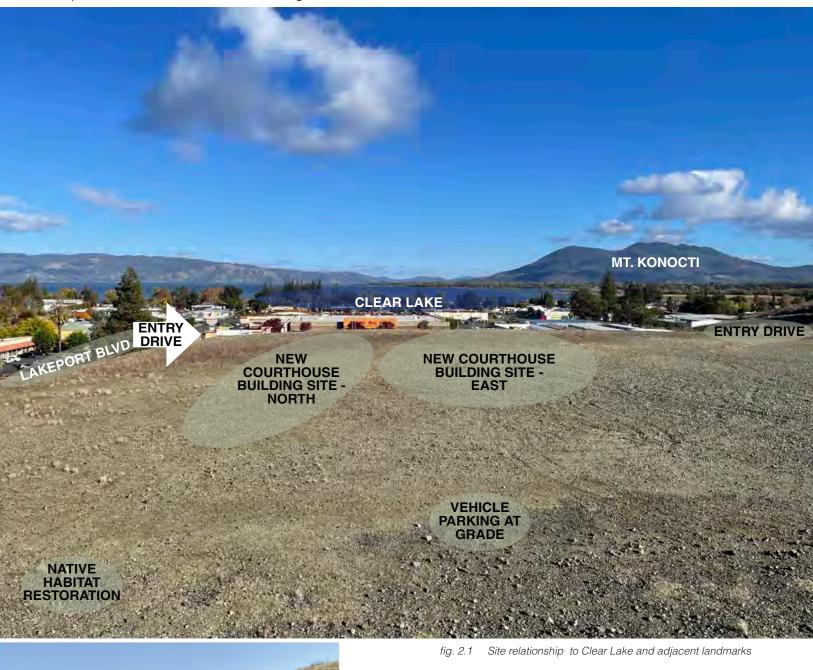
Courthouse site on bench 50' above Lakeport Blvd.
